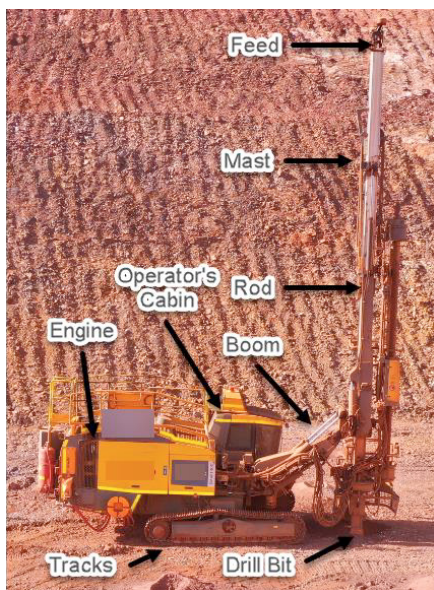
Typical layout of a surface mining blast drill rig (Type: Epiroc D65)
